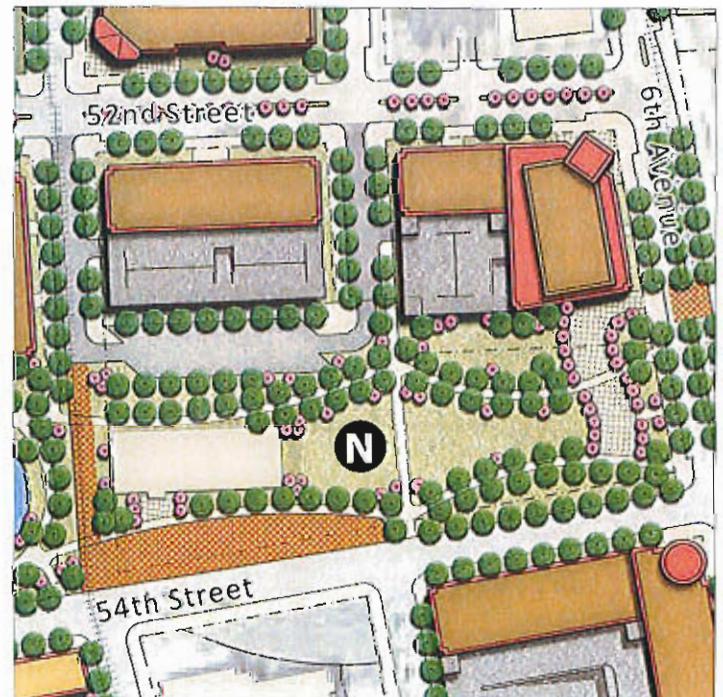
Conceptual Plan Alternative for City Center Open Space
